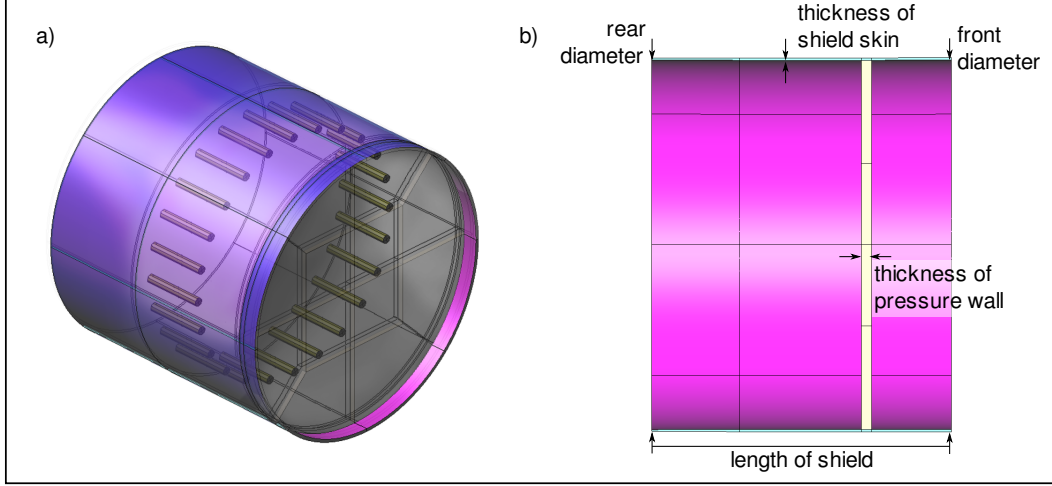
Geometrical model of the shield machine: a) transparent view of shield geometry and hydraulic jacks; b) dimensions of the shield
